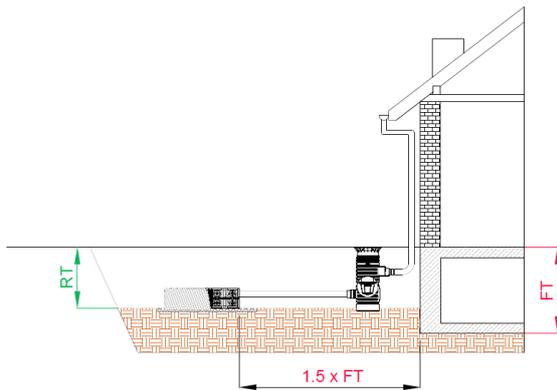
Installation situation: Foundation deeper than infiltration ditch module
